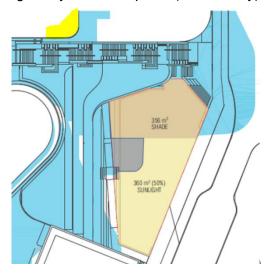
2pm shadow diagram with additional shadow cast by the 9 storey section of Building D shaded blue, and Building D highlighted yellow.
